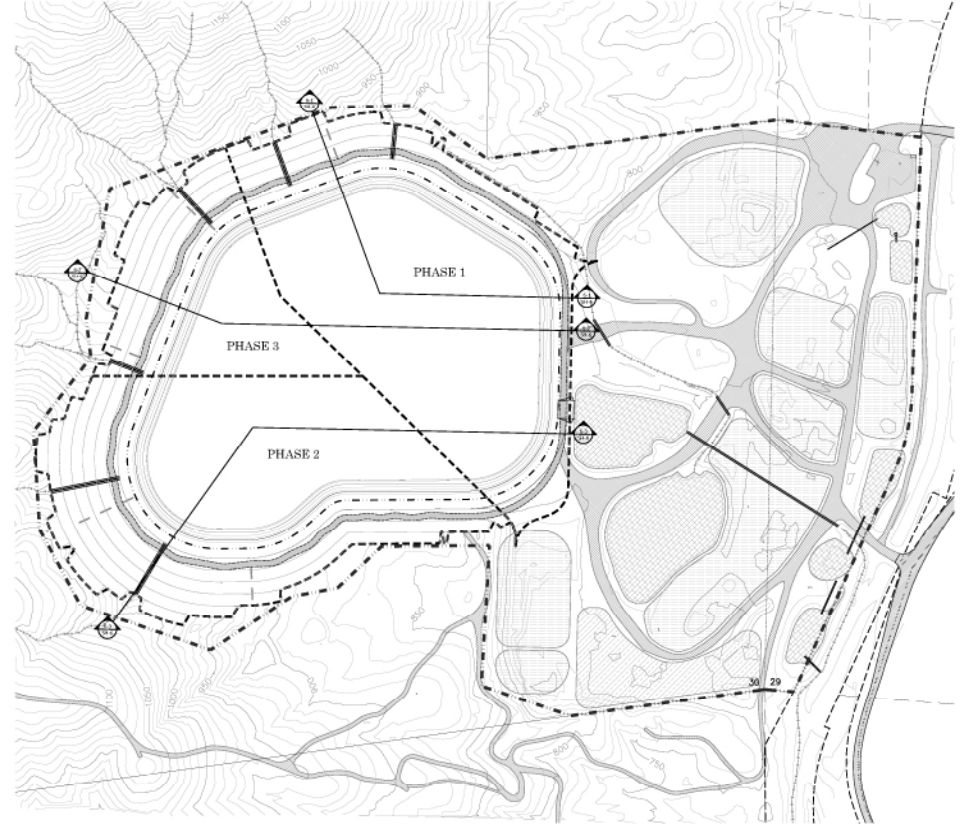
, PROPOSED QUARRY CROSS-SECTIONS
